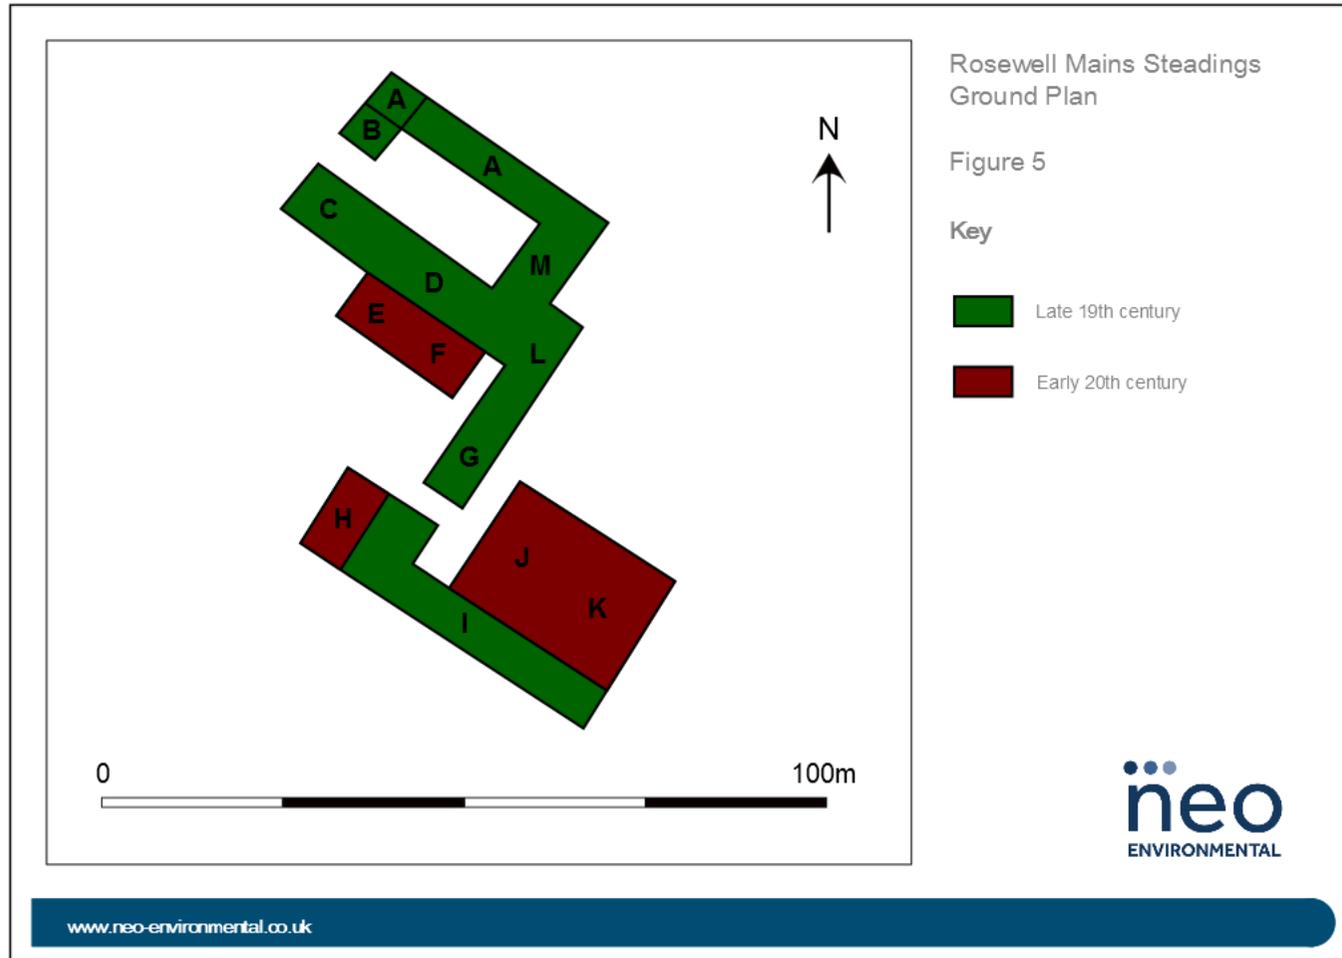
GROUND PLAN OF ROSEWELL MAINS STEADINGS
